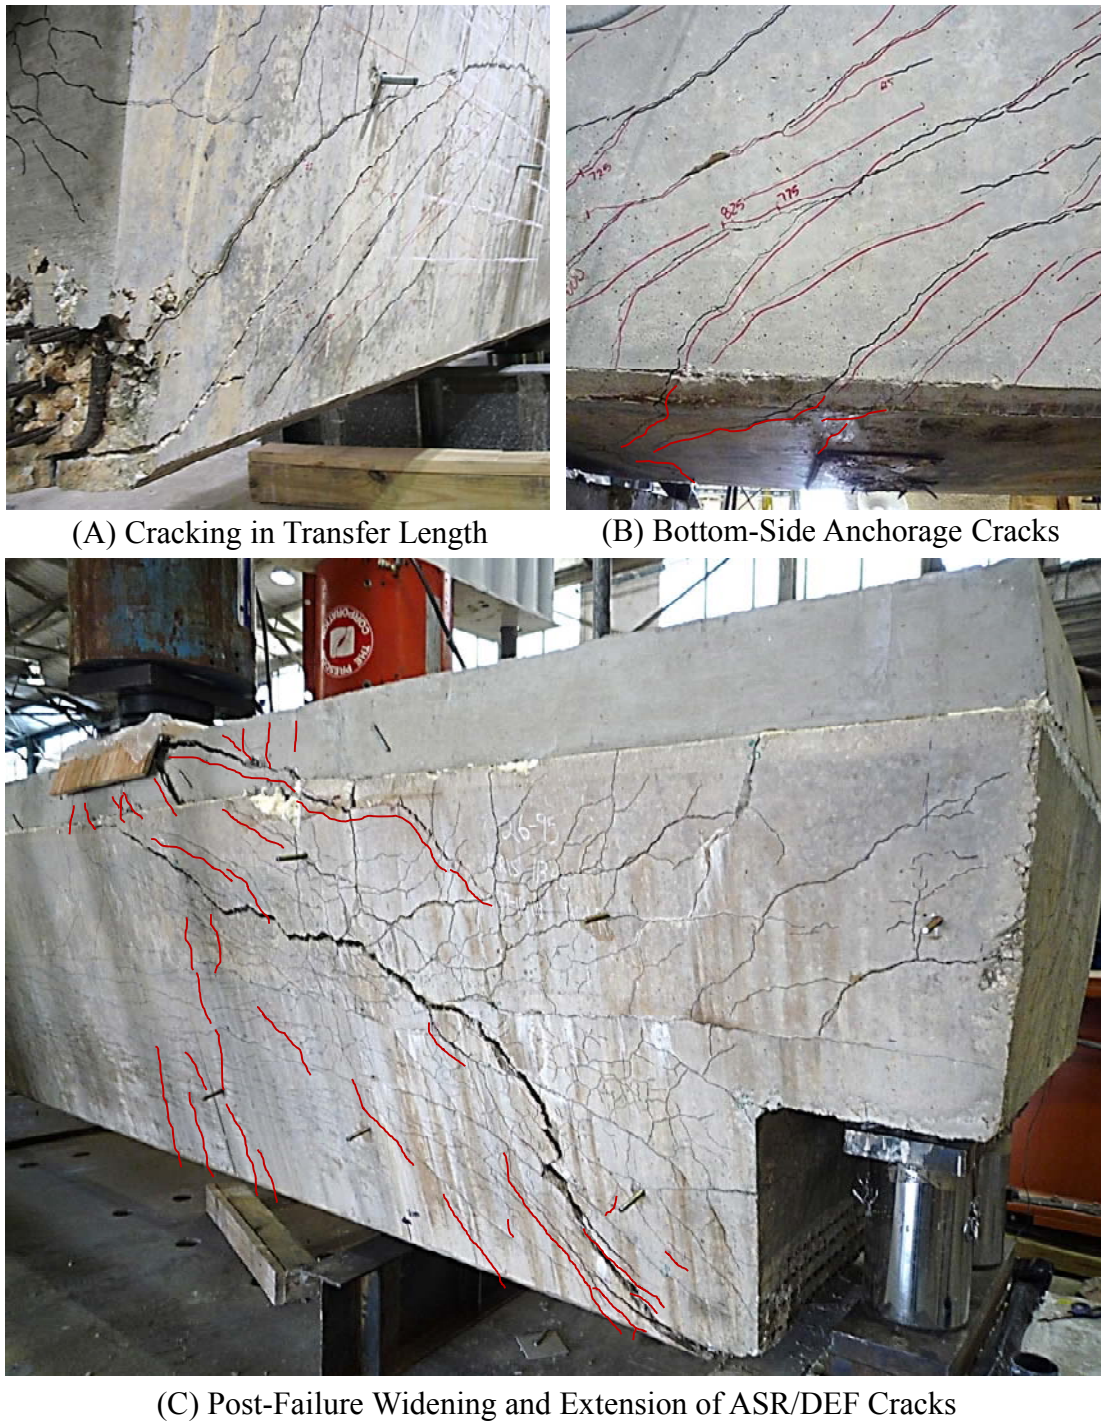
Typical Features of ASR/DEF Damaged Segment Failure
